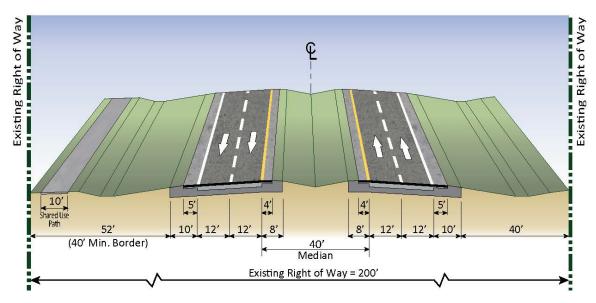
SR 29 Typical Section from Experimental Road to South of SR 82
